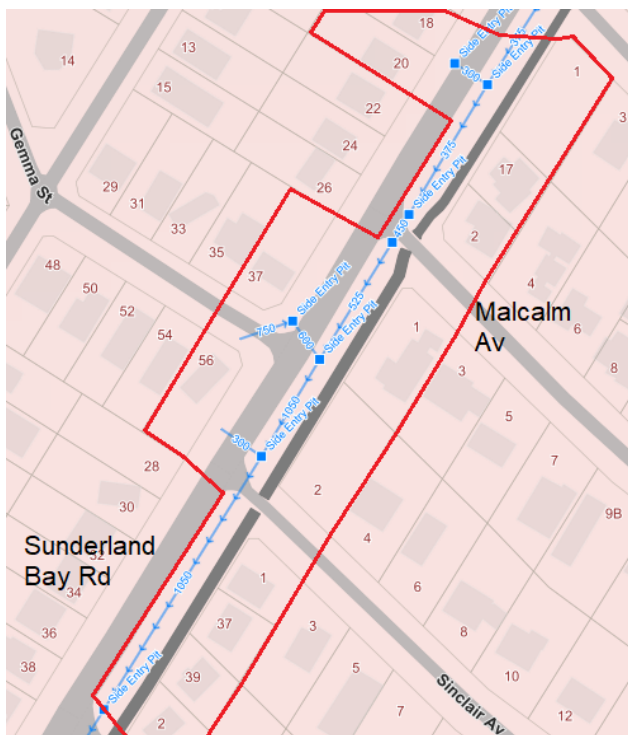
D: Minor existing underground drainage system (Sunderland Bay Rd mid section)
